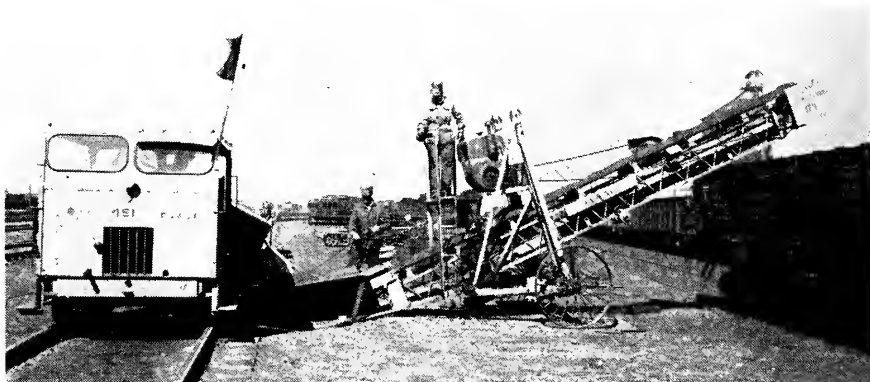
One of the portable elevating loaders used to dispose of the yard refuse in cars.
